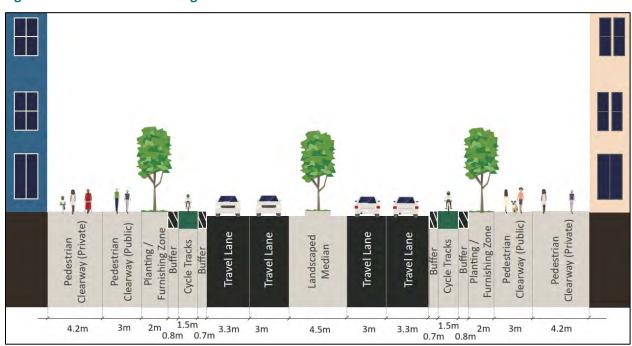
Recommended Yonge Street Cross Section - Mid-Block
